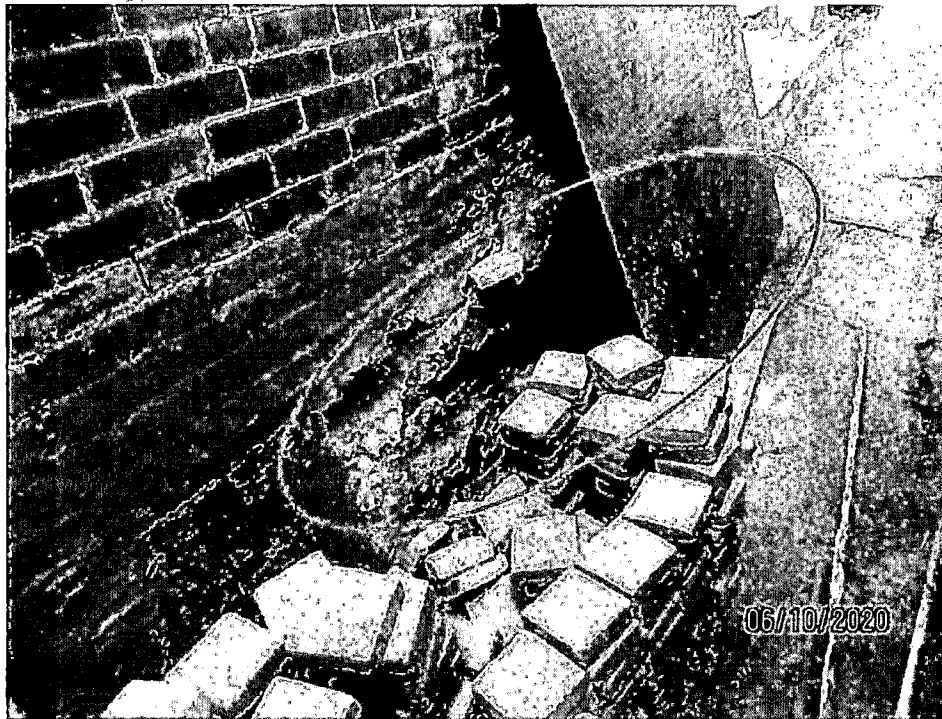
View of the north foundation wall at the northwest corner of the building. Note that the displaced bricks are mortared into their displaced positions.
